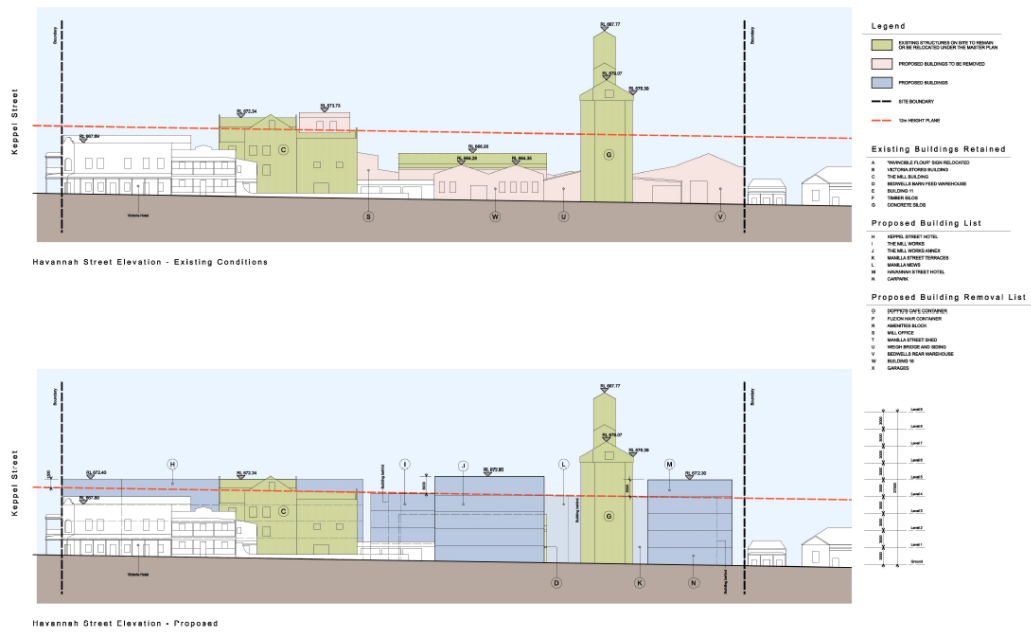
Havannah Street elevation (Source: Karl Walls Design)
